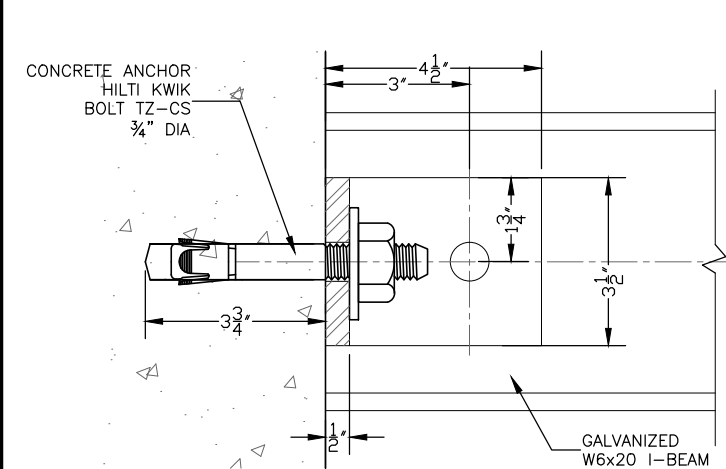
I-BEAM ATTACHMENT TO CONCRETE (PLAN VIEW)
